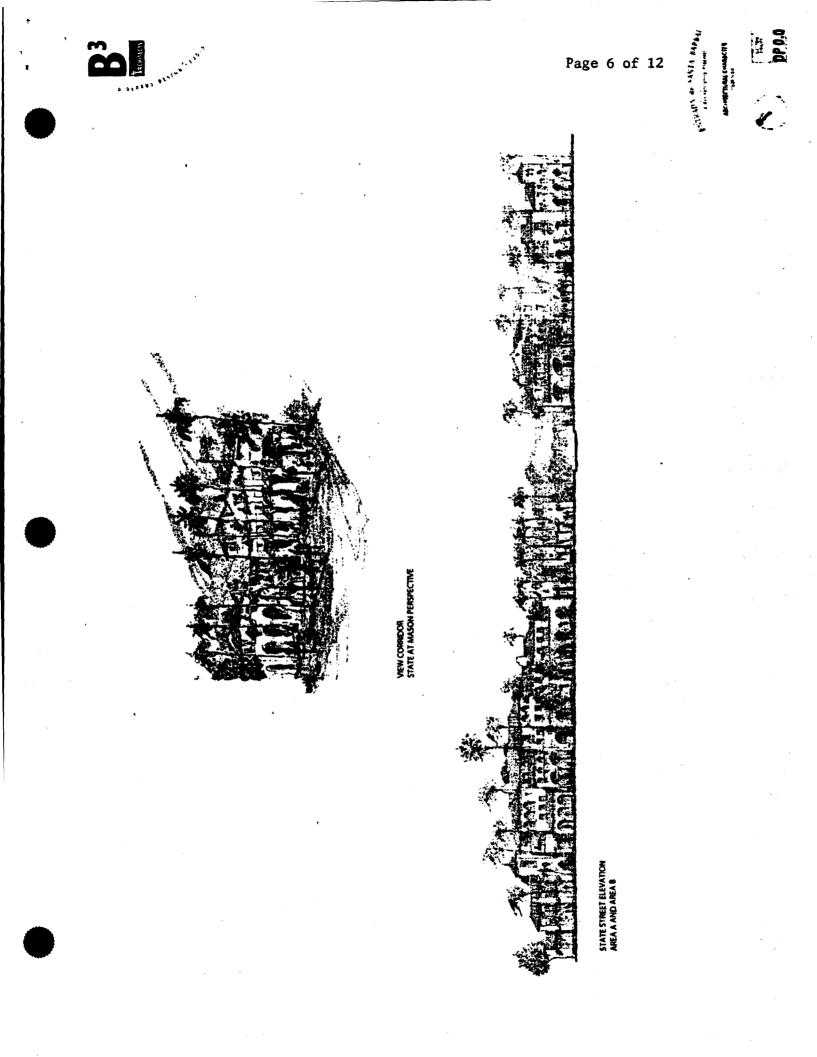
Project Design for Californian Hotel. Southeast and southwest elevations Courtesy David VanHoy, B3 Architects + Planners
